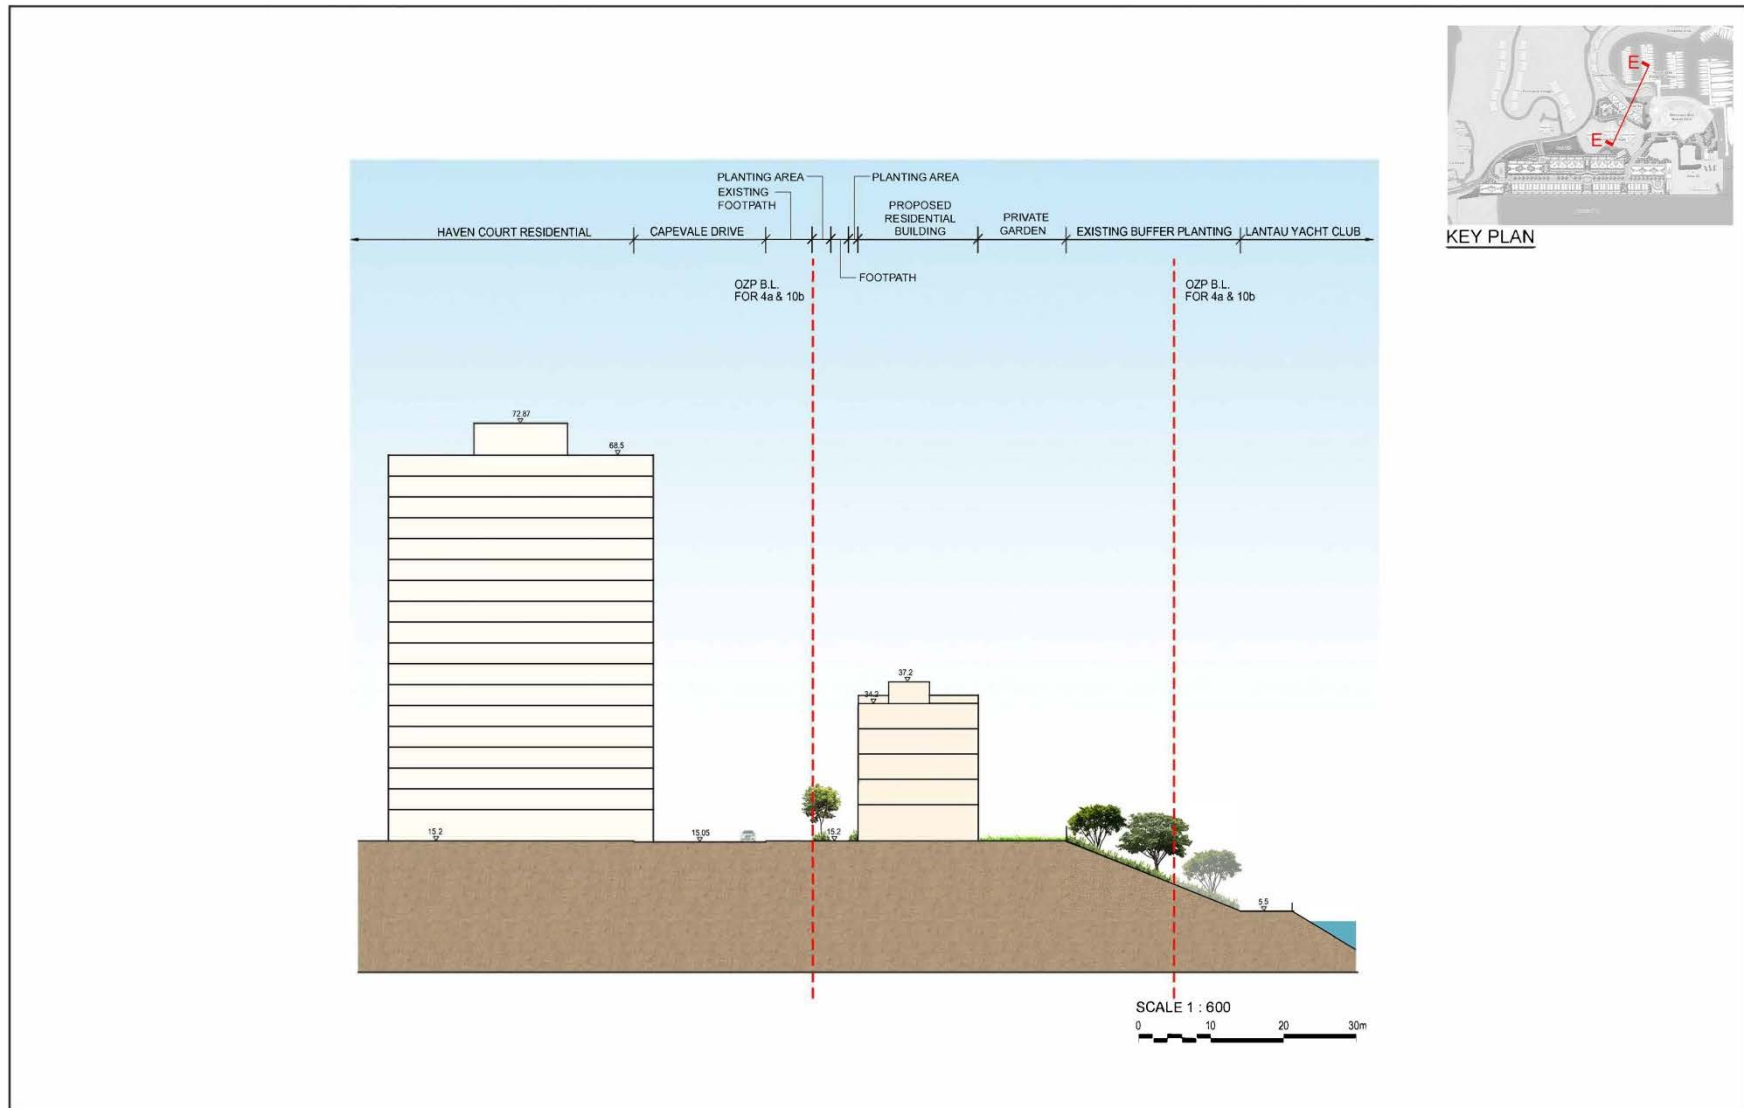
Section E:E showing the existing residential development Haven Court and the new proposed 5 storey development.
